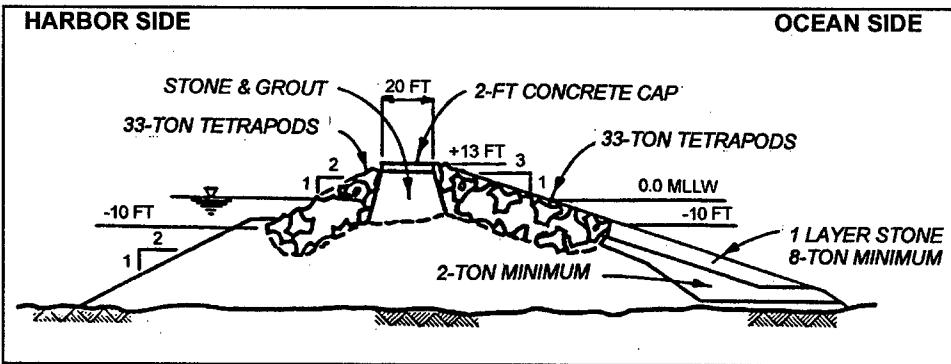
Typical cross section for 1956 Kahului breakwater repairs
